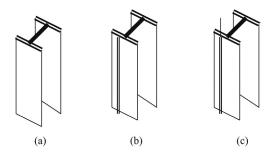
Preparation of pile for settlement measurements. (a) Regular H-pile is shown. (b) A pipe is welded to the H-pile. (c) A rod is inserted into the pipe (the procedure can be done for steel pipe piles, concrete piles, or timber piles).
